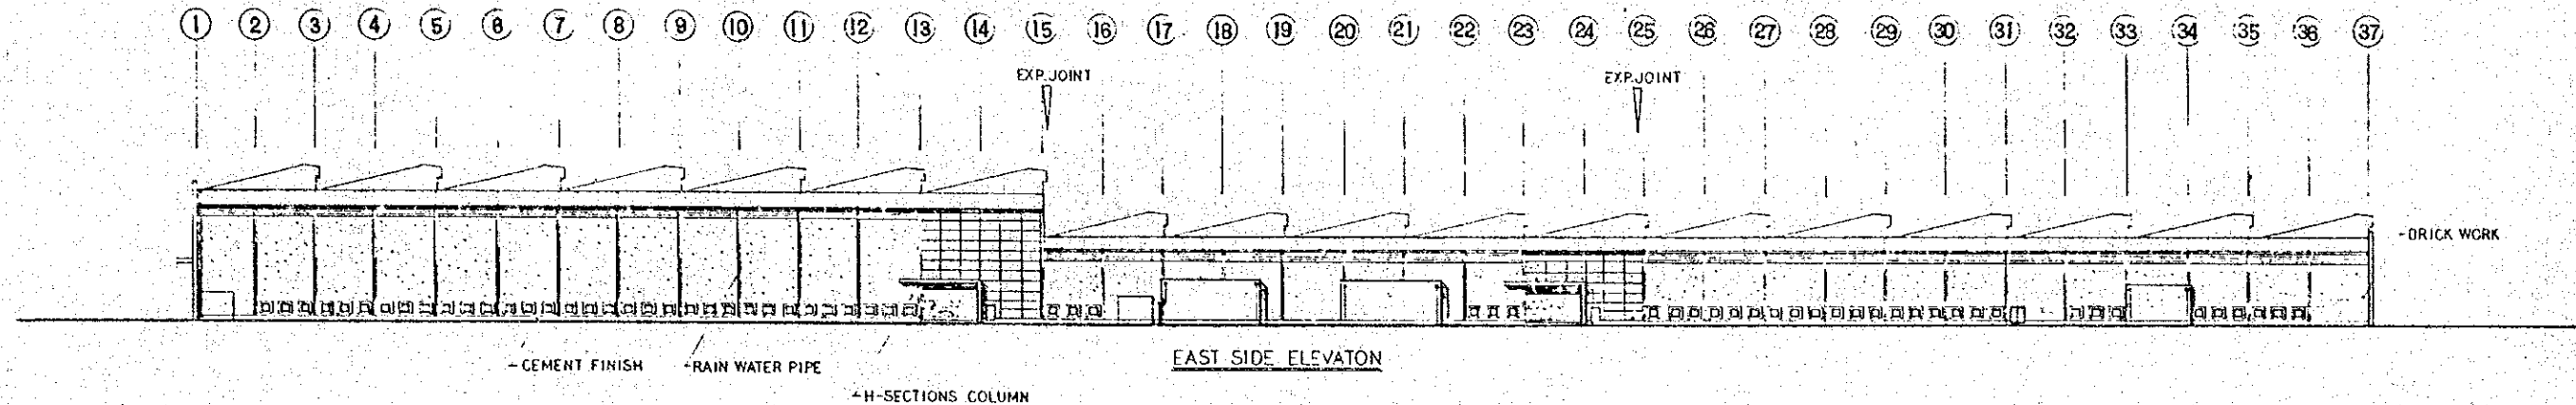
MAIN WORKSHOP BUILDING
